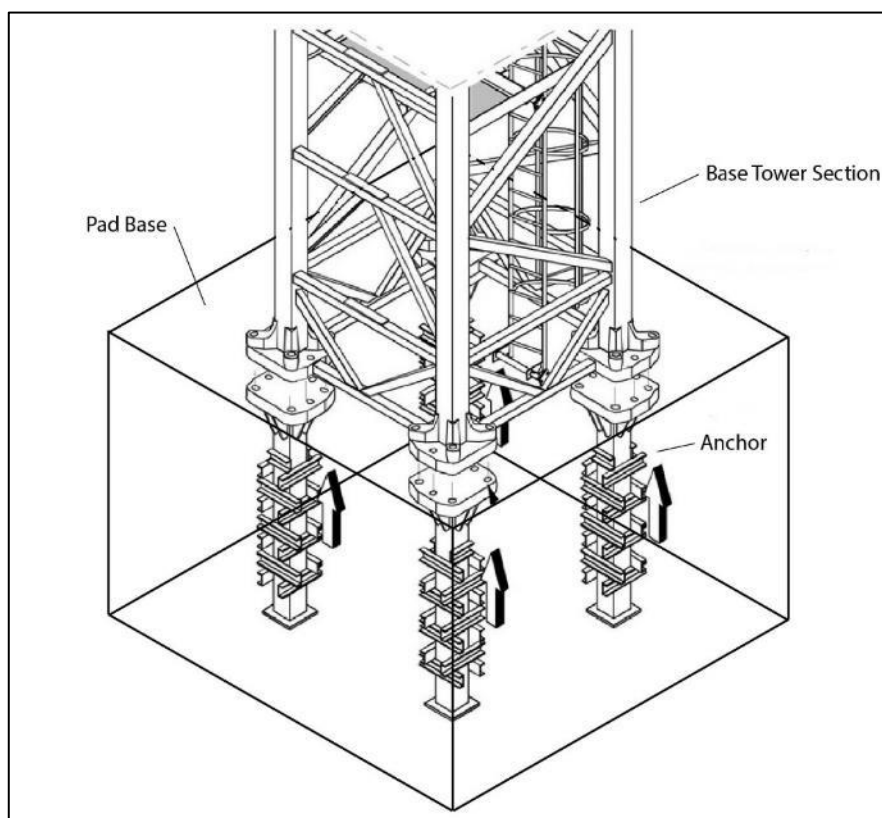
Anchored foundation for tower-cranes (adapted from <https://goo.gl/q9Uqhx>)
